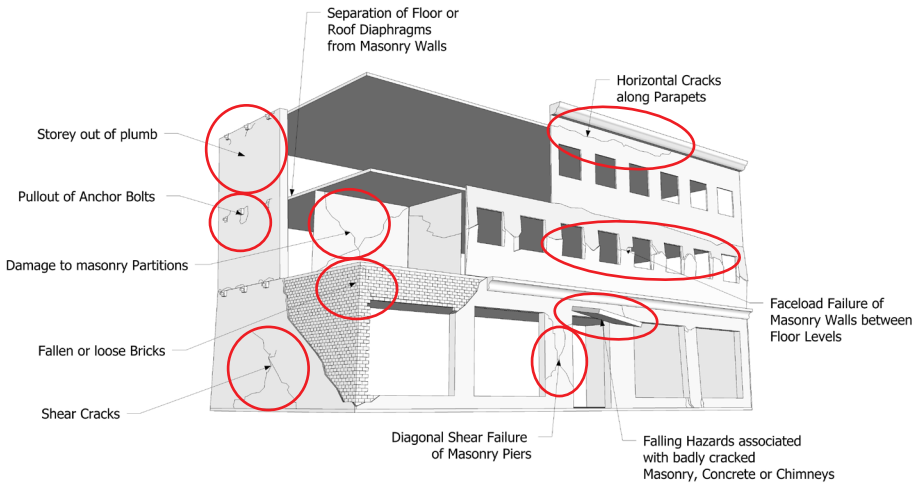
Typical damage areas in unreinforced masonry structures
